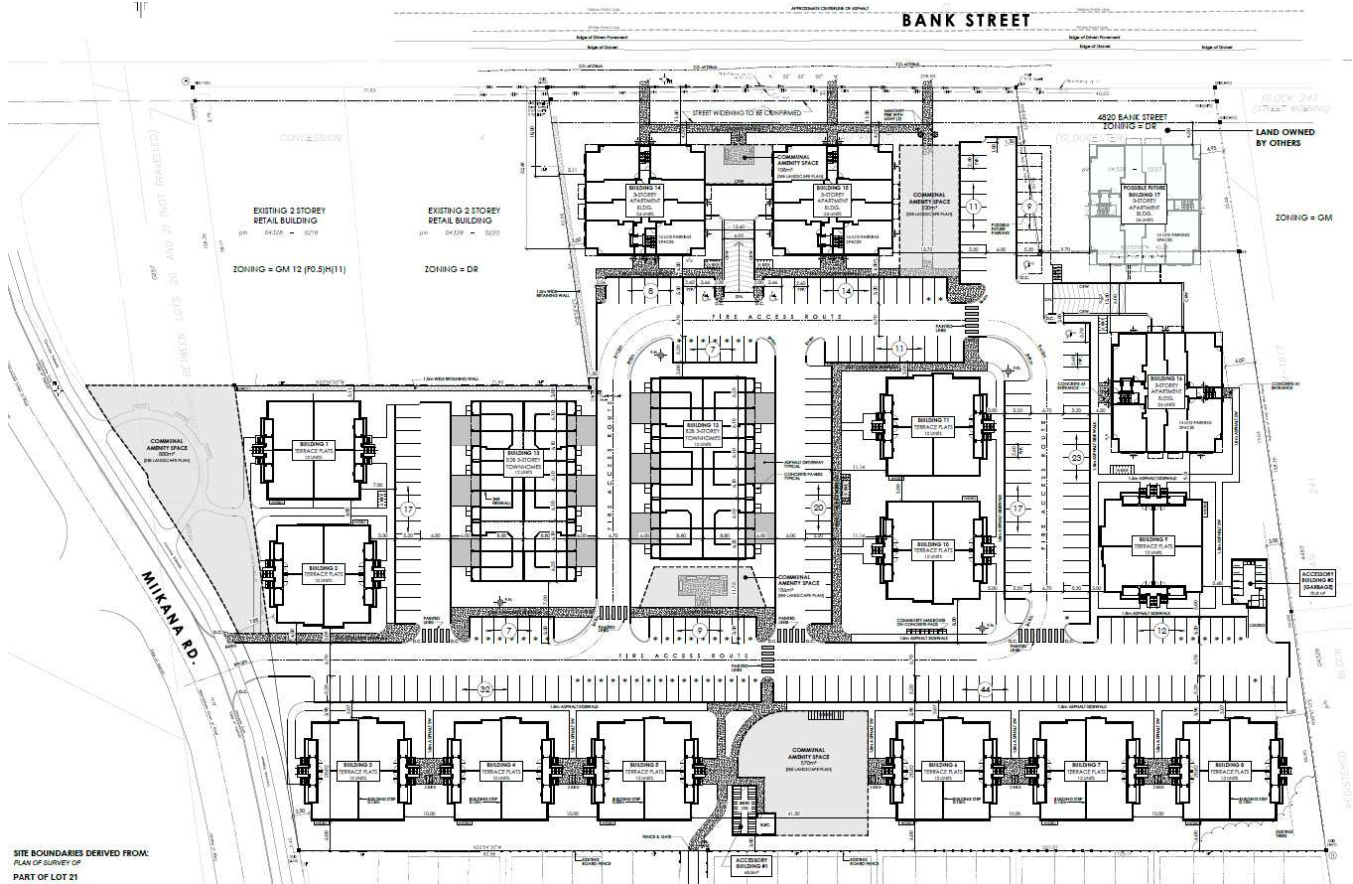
Site Plan, prepared by M. David Blakely Architect Inc.
